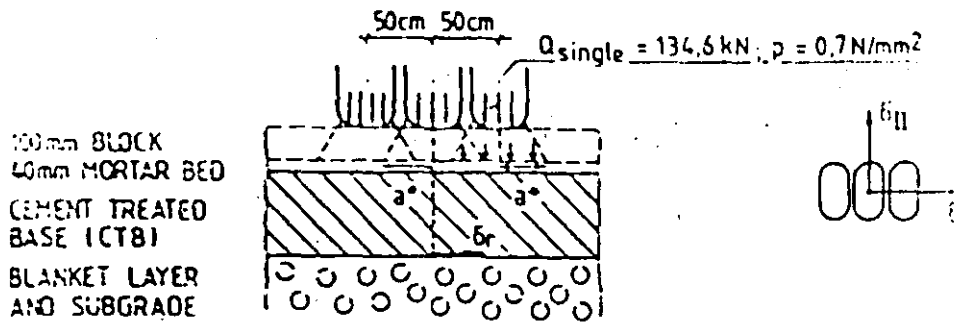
Concrete block pavement for container terminals: bending tensile stresses at bottom of the cement treated base under container loading
